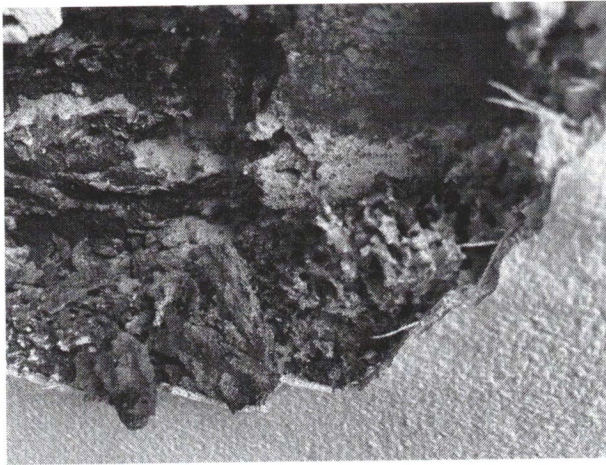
View of significant deterioration of studs, sheathing, and insulation within the Stair #2 spandrel wall.
